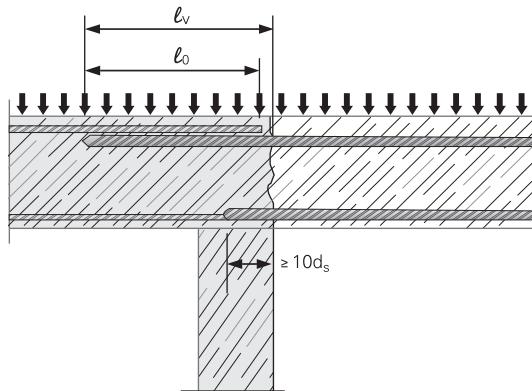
Overlap joint for rebar connections of slabs and beams.
